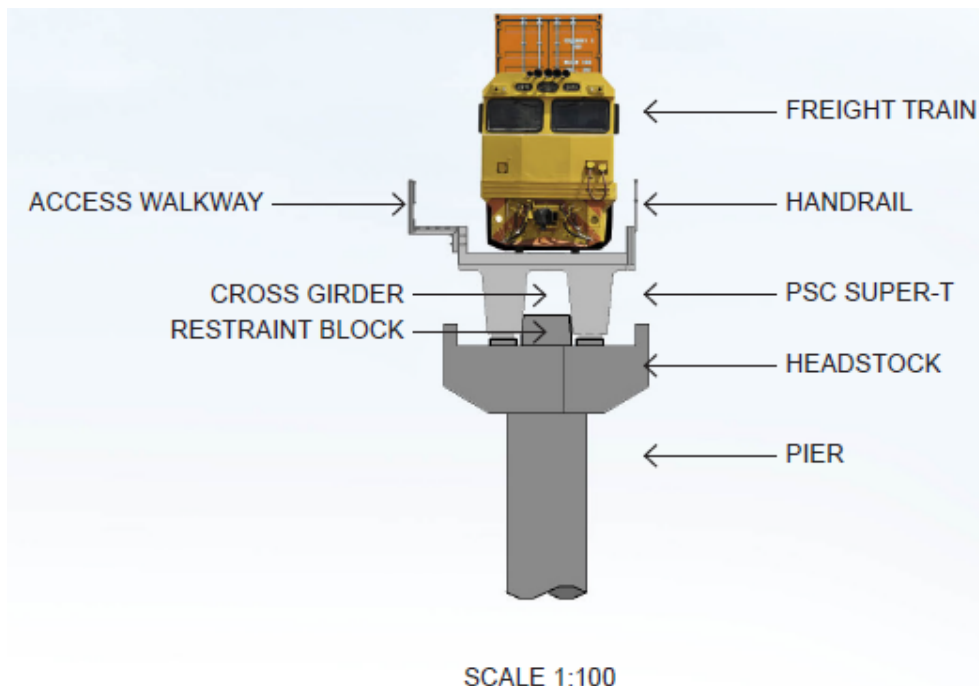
TYPICAL PIER WITH PRE-STRESSED CONCRETE SUPER-T GIRDER
